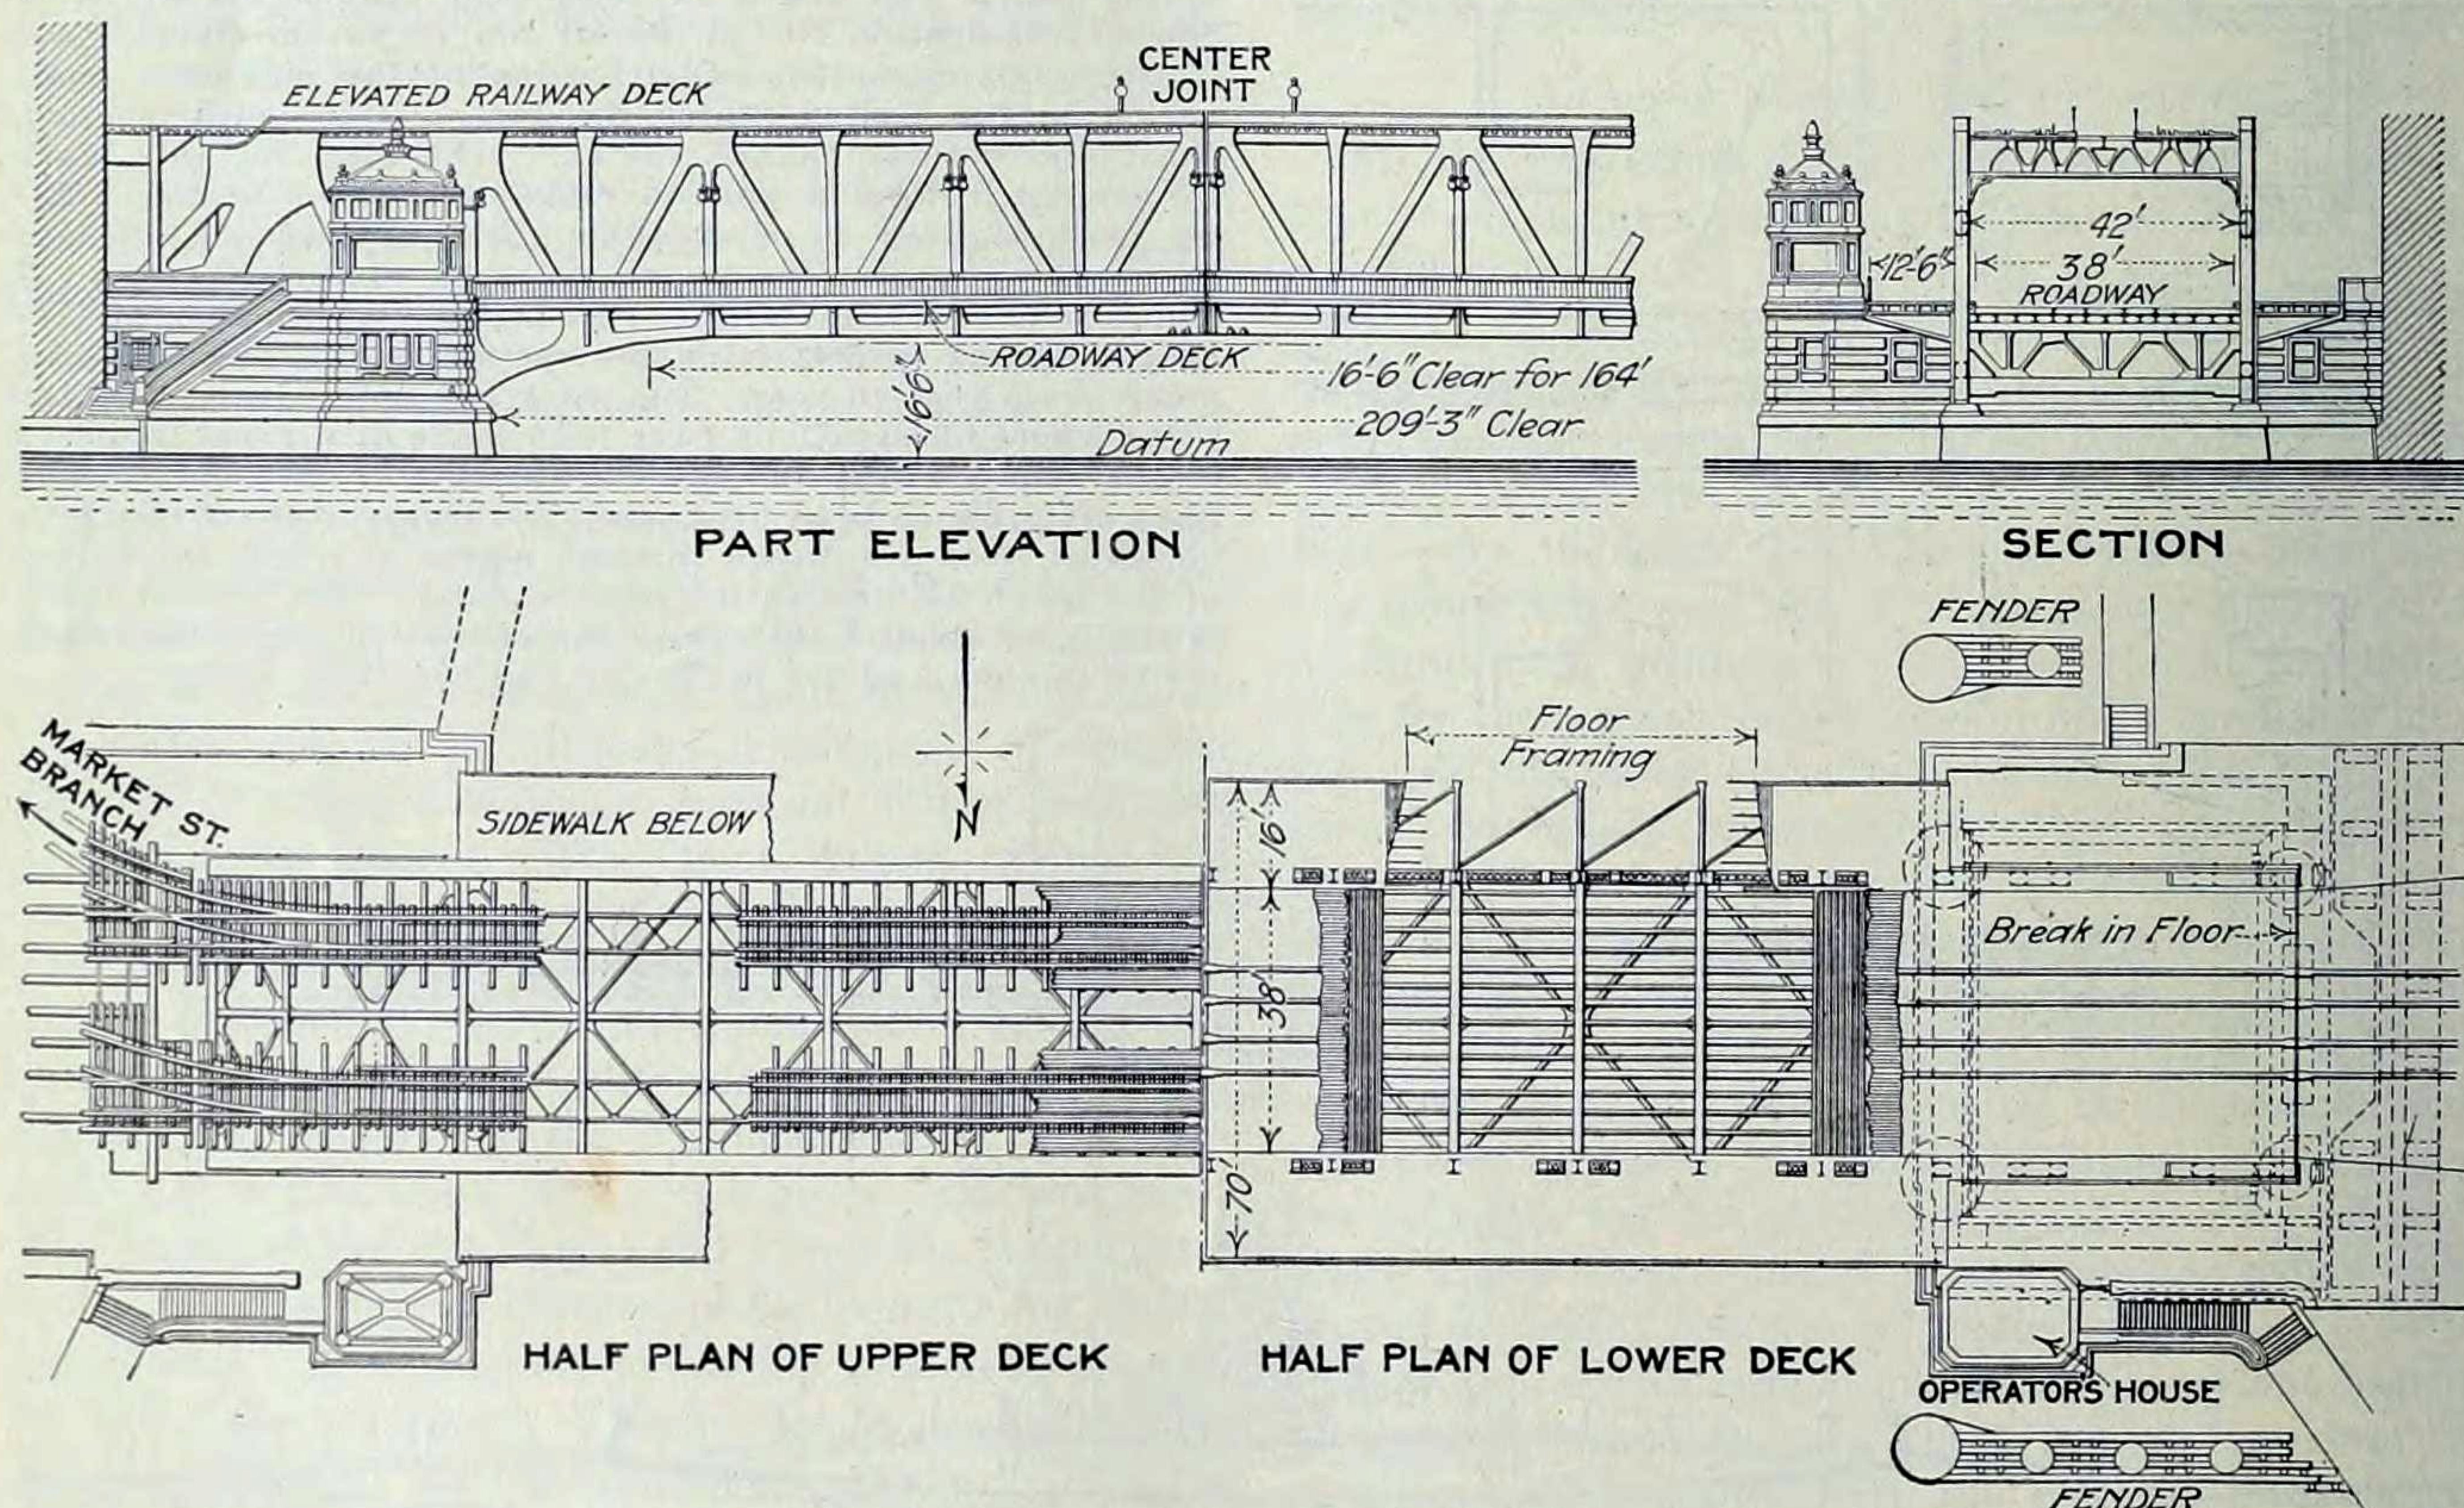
ELEVATION AND PLANS OF THE DOUBLE-DECK DOUBLE-LEAF TRUNNION BASCULE BRIDGE ACROSS THE CHICAGO RIVER AT LAKE ST., CHICAGO, ILL.
